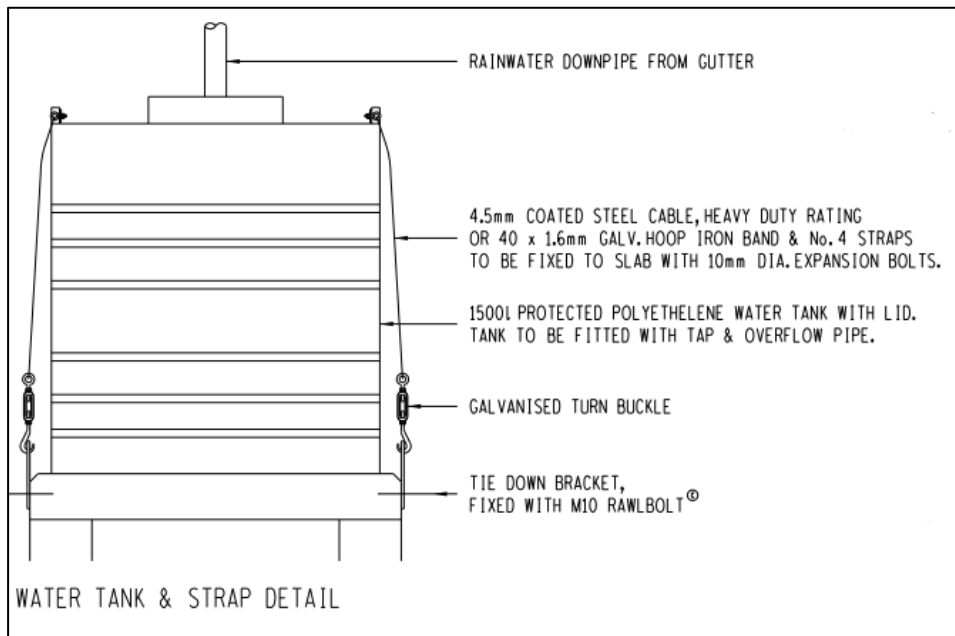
Detail showing fixing and strapping of rainwater tank (excerpt from Drawing Sheet 05)
